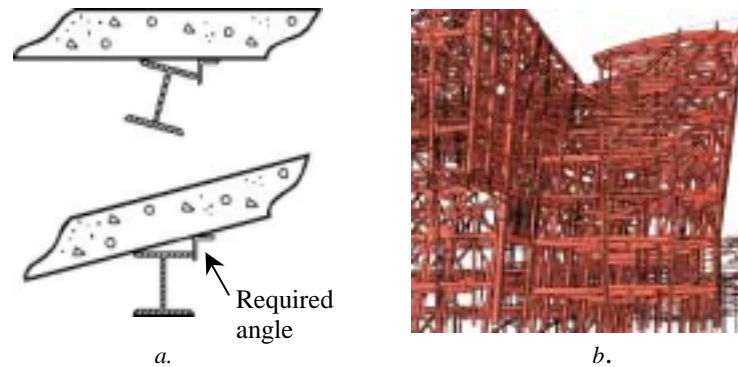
a. A slab slopes in relation to the beam, requiring an angle for support.
